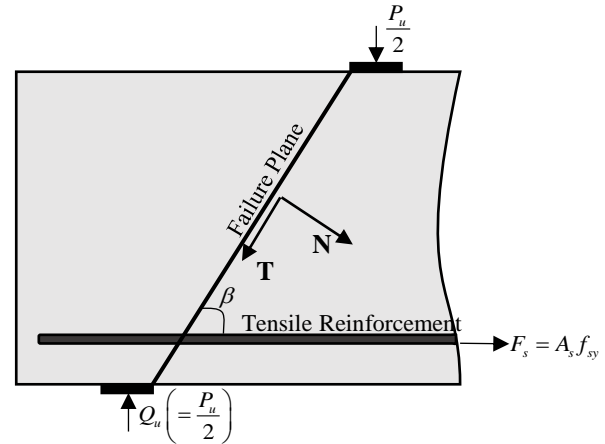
Typical RC deep beams ultimate strength under two-point loading.
